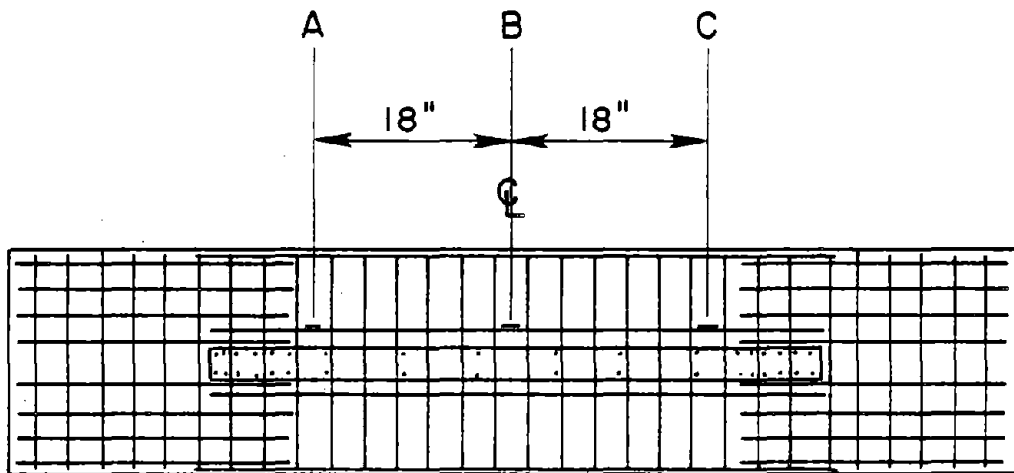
Strain Gage Locations on Slab Reinforcement
